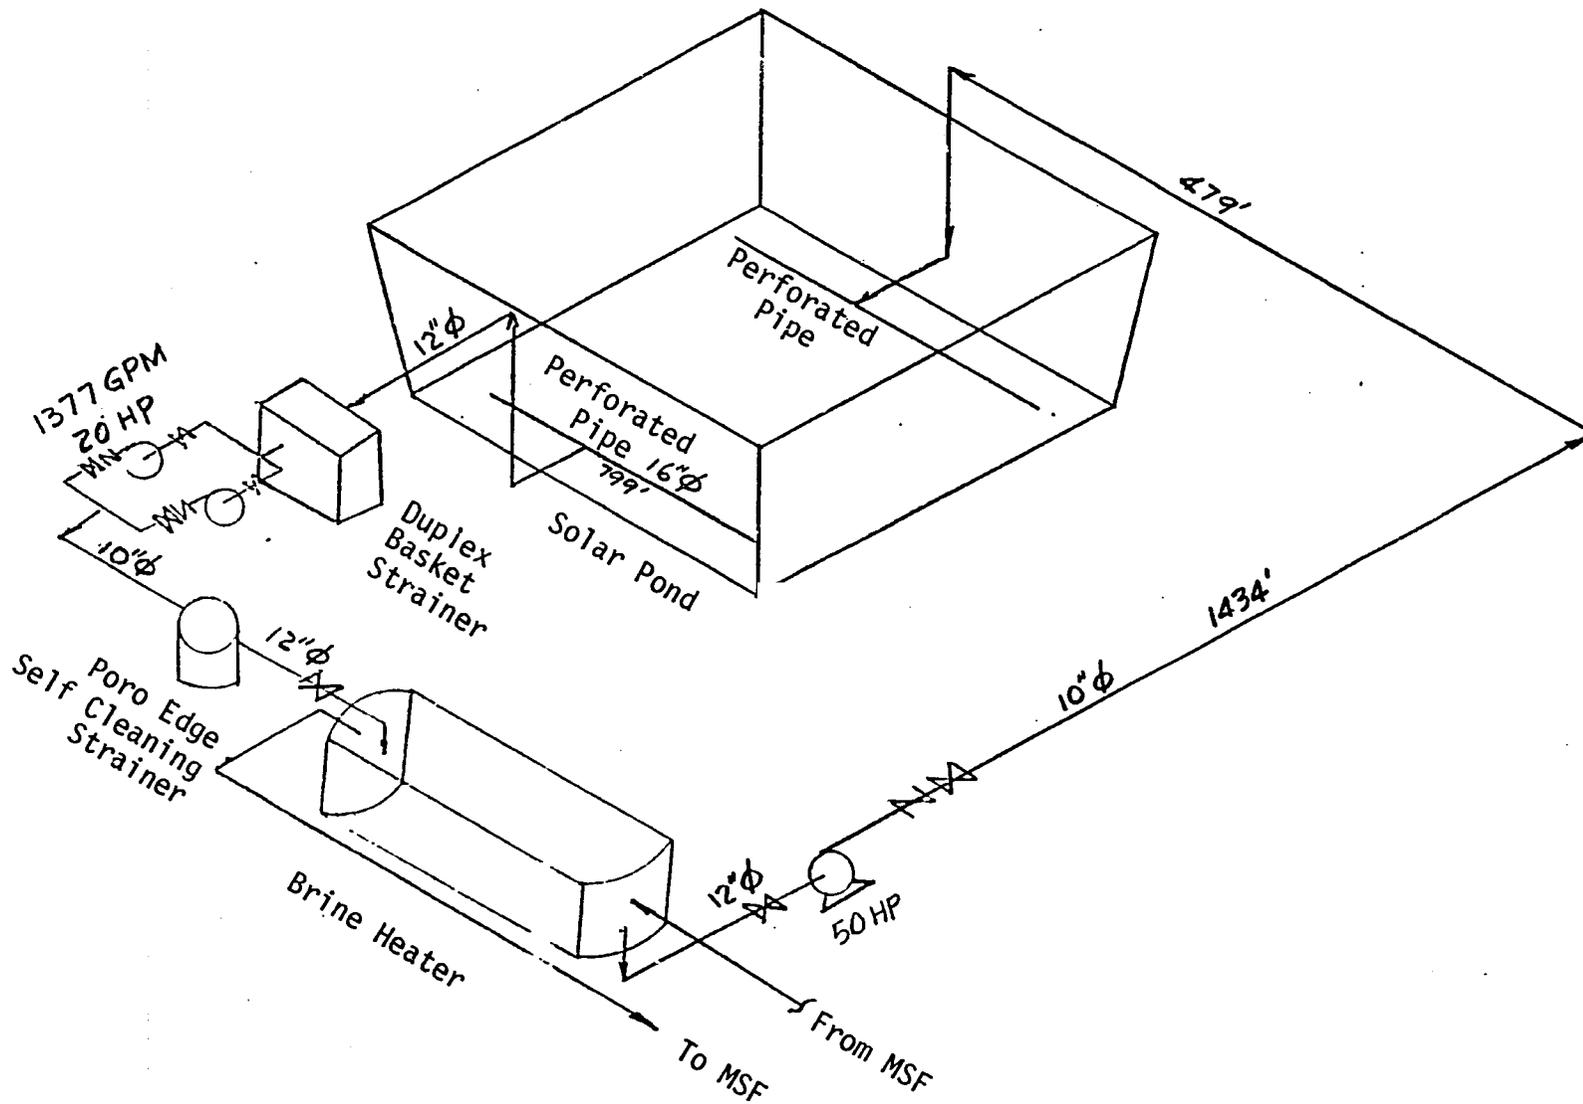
SALT GRADIENT POND PIPING AND EQUIPMENT AT MSF - PR6
